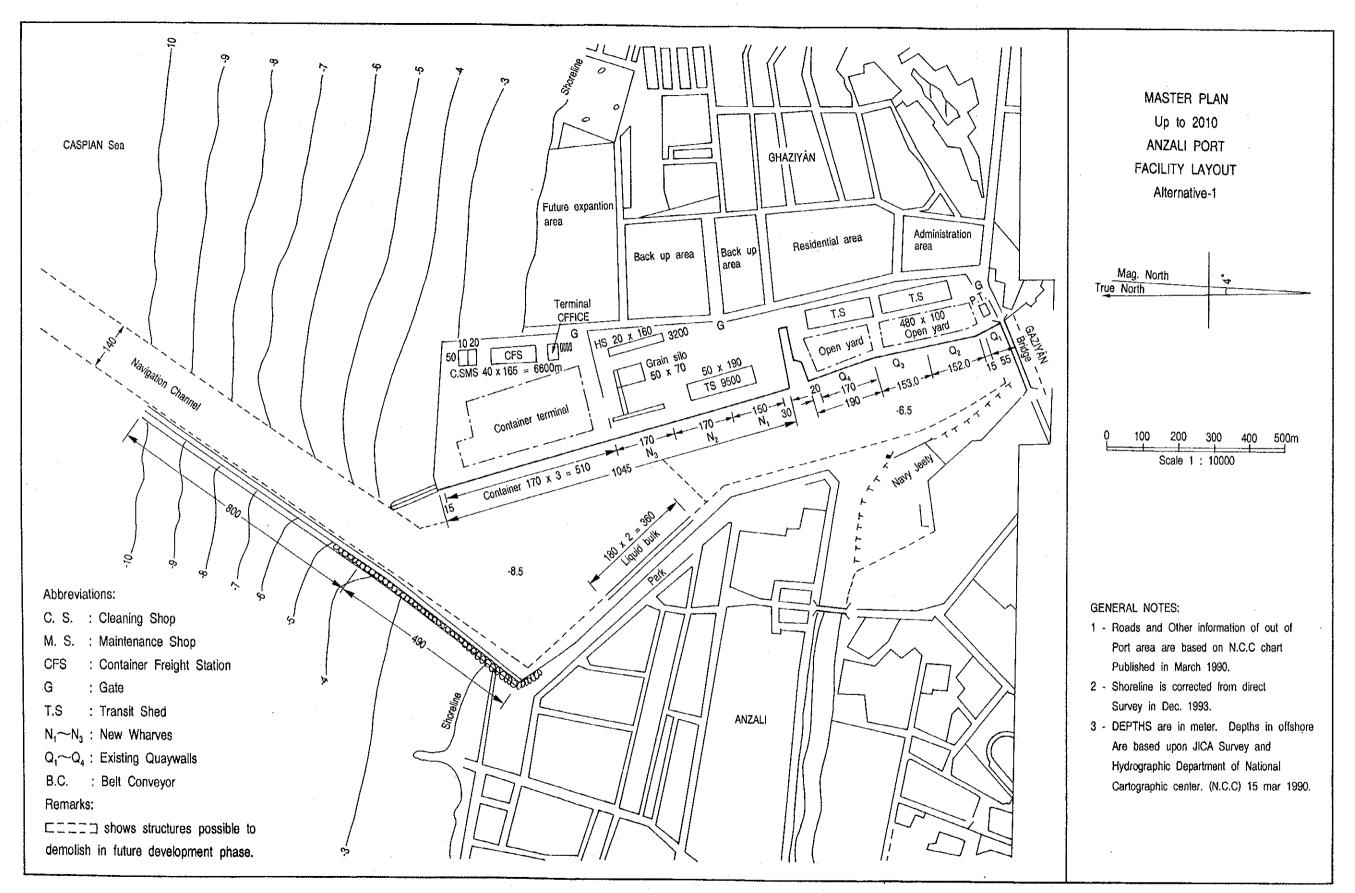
Alternative Plan 1 (Master Plan)
